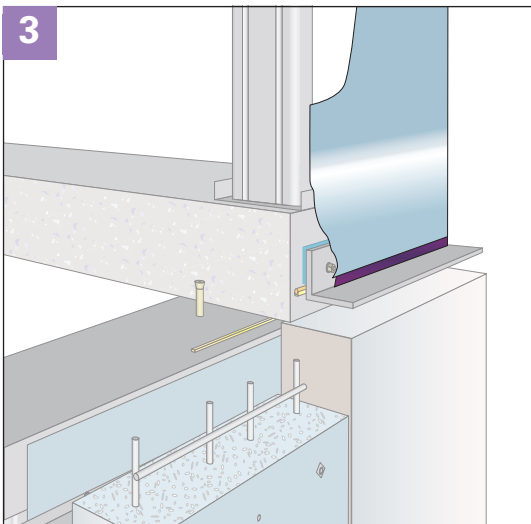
Construction of a Hebel Facade Wall System (Hidden Slab Edge HEB2000)
